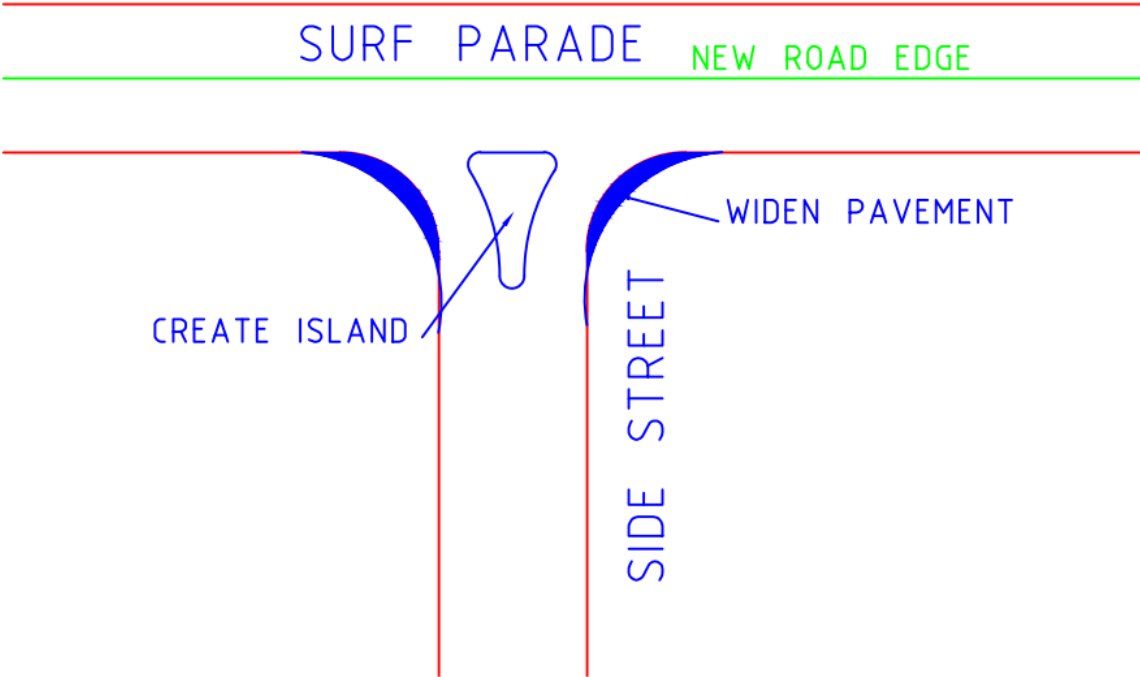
Sketch showing sample Left in, Left out (LiLo) treatment
